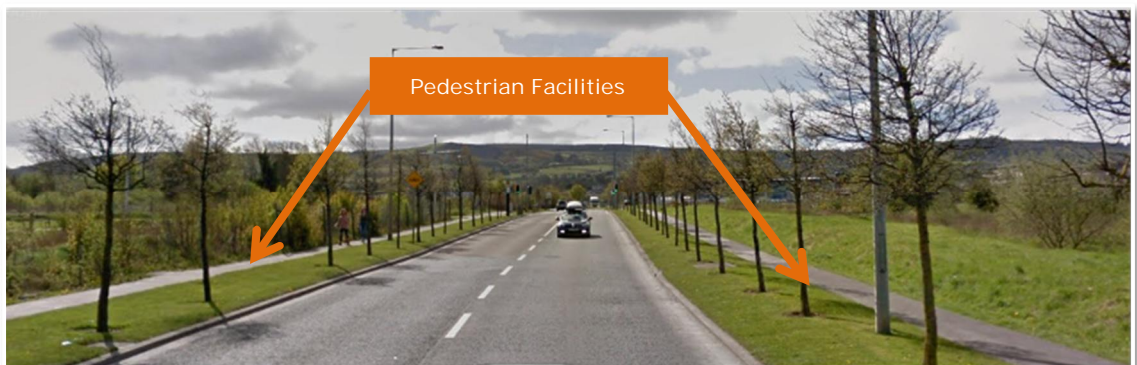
Pedestrian Facilities on N82 Citywest Road
